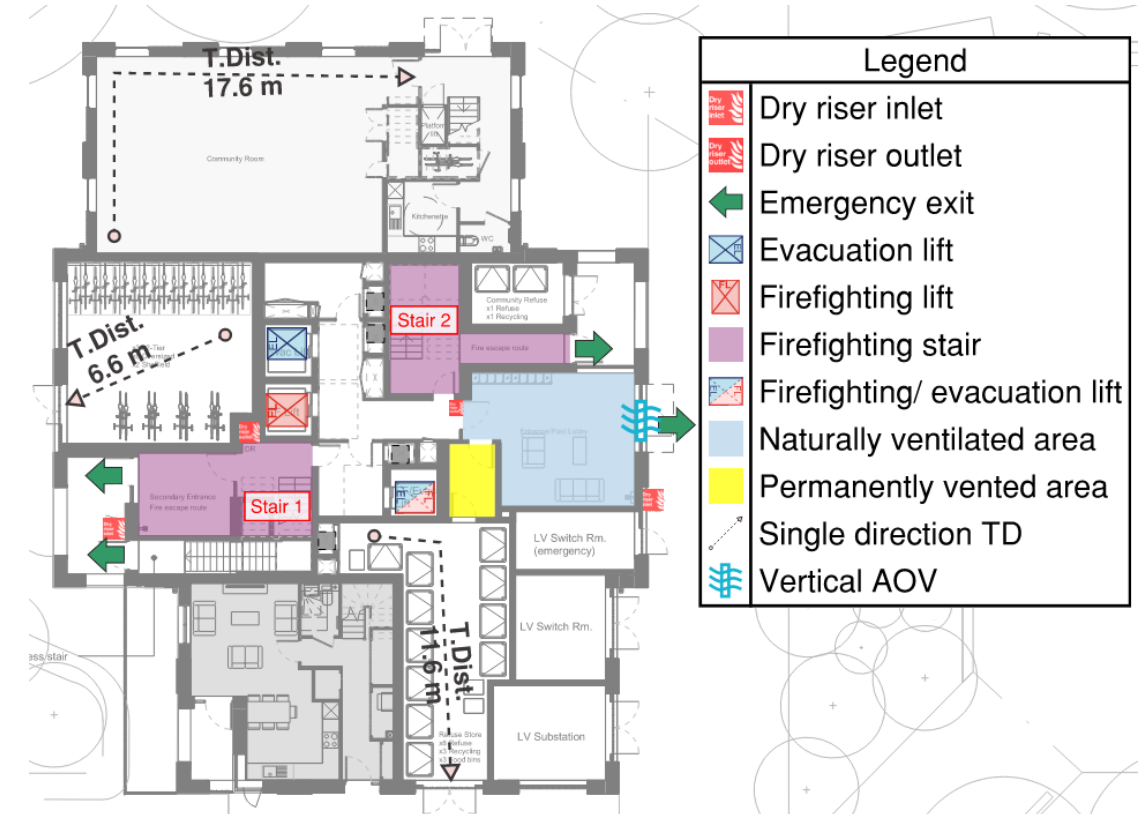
Indicative layout indicating means of escape from Level 00 - Tower Block
